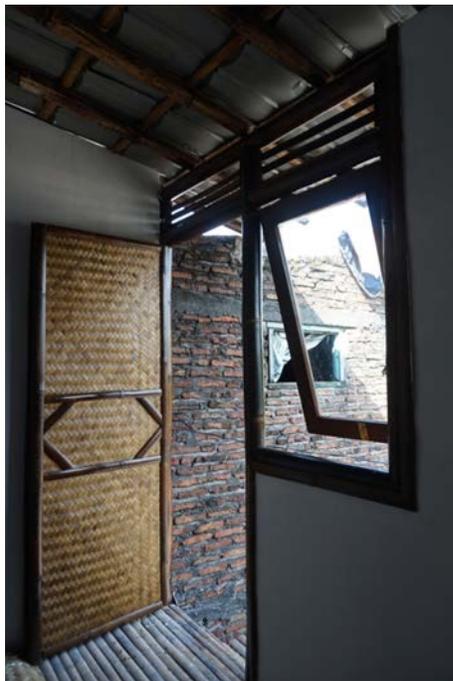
a)Window for lighting b) Wall cover of calciboard; rafter and batten of preserved bamboo
